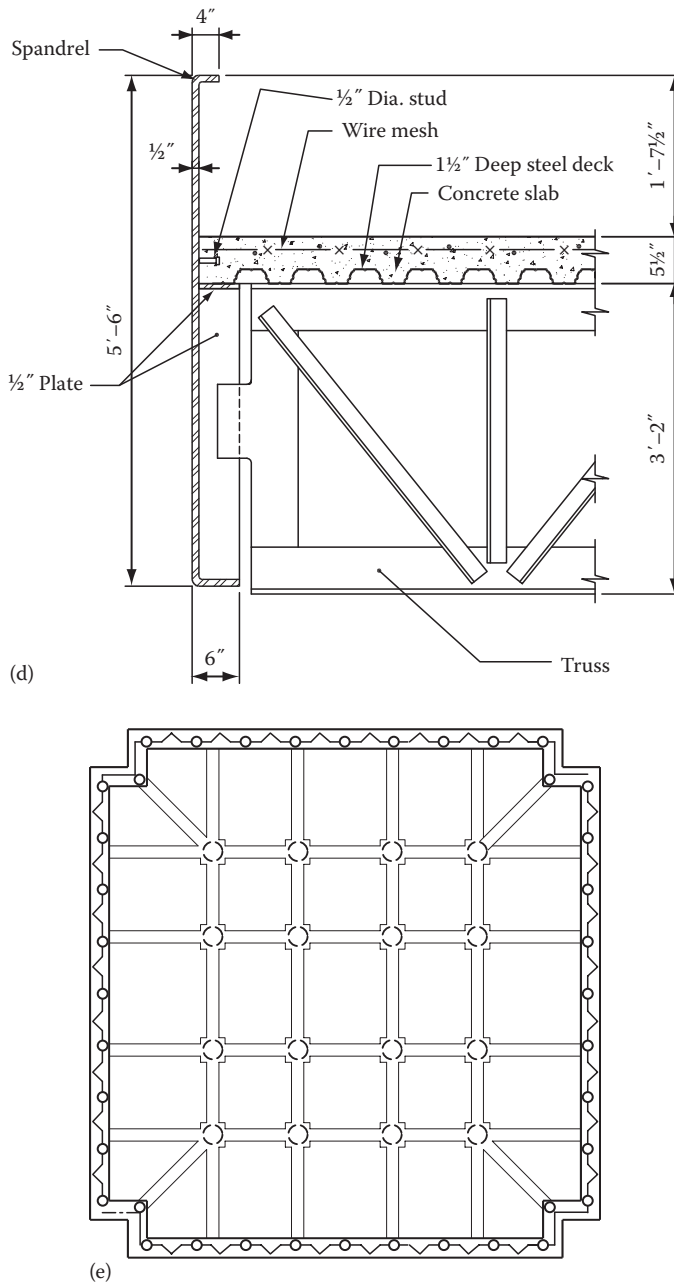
(Continued) Standard Oil Building of Indiana, Chicago; (d) cross section of spandrel beam, floor trusses, and deck; (e) plan at top of caissons.
